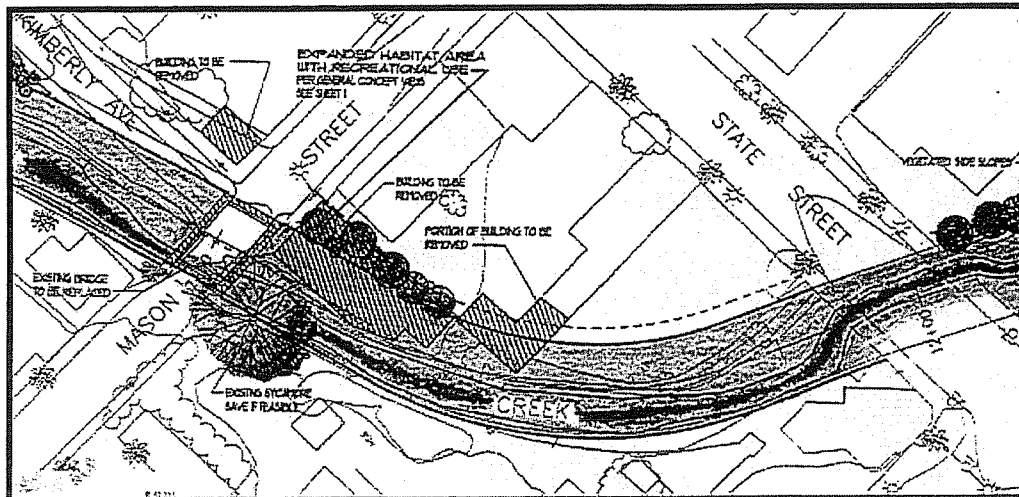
Mason Street Bridge to State Street Bridge
